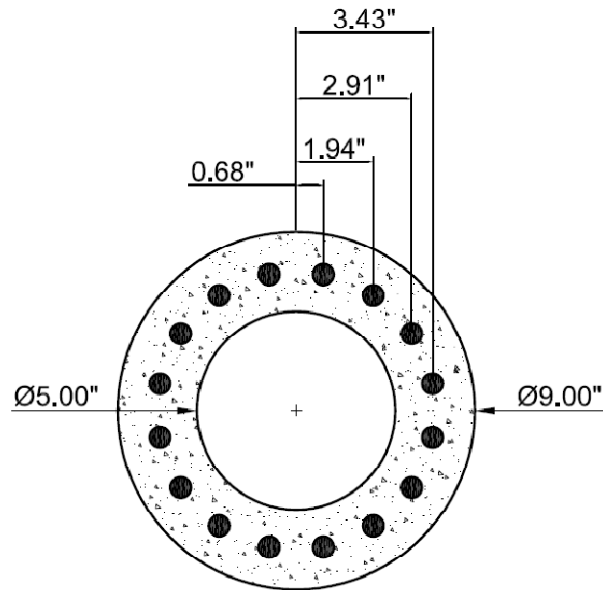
An Illustration Showing the Cross Section of the UHPC Horizontal Brace 9x2 in. (229x50.8 mm) with 16-0.6 in. (15mm) Strands
